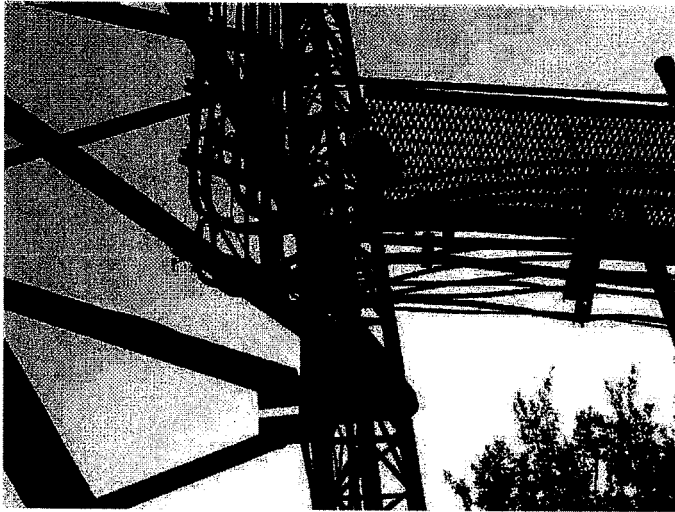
Fire Department tower ground bar showing conductors routed down tower leg and minimal drip loops
